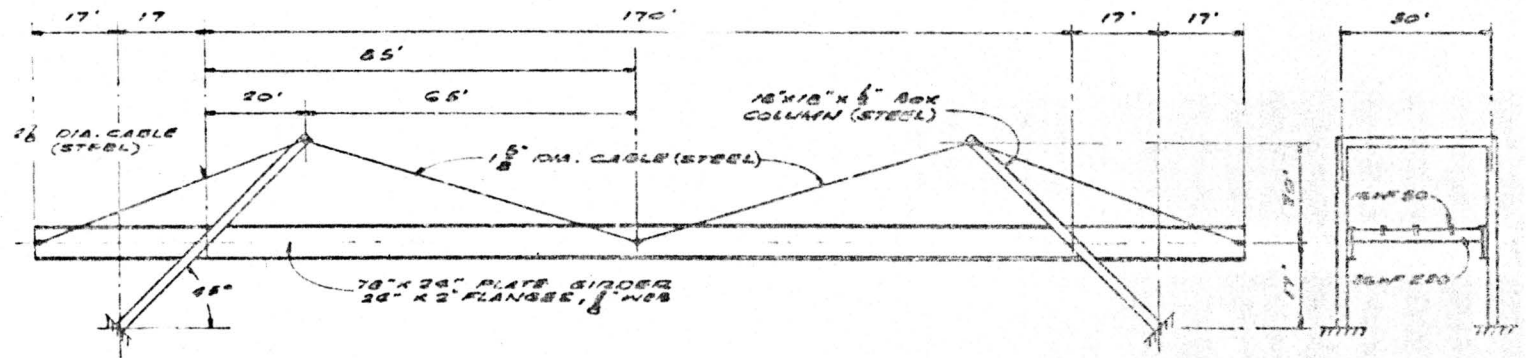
CONCEPT DESIGN SKETCH OF LEANING PIERS
